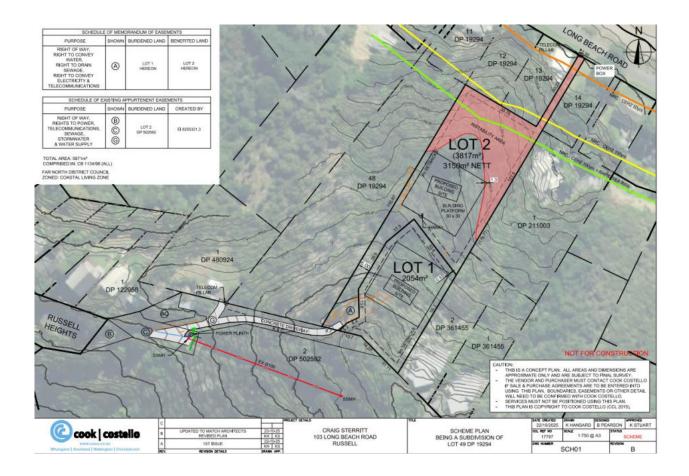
Excerpt of the scheme plan, showing the proposed subdivision.
